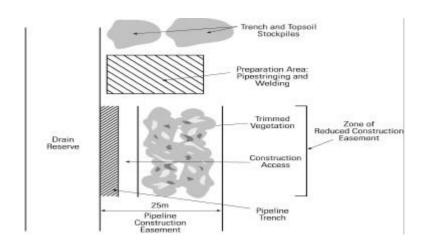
Zone 3 Typical Restricted Right-Of-Way Construction Area
